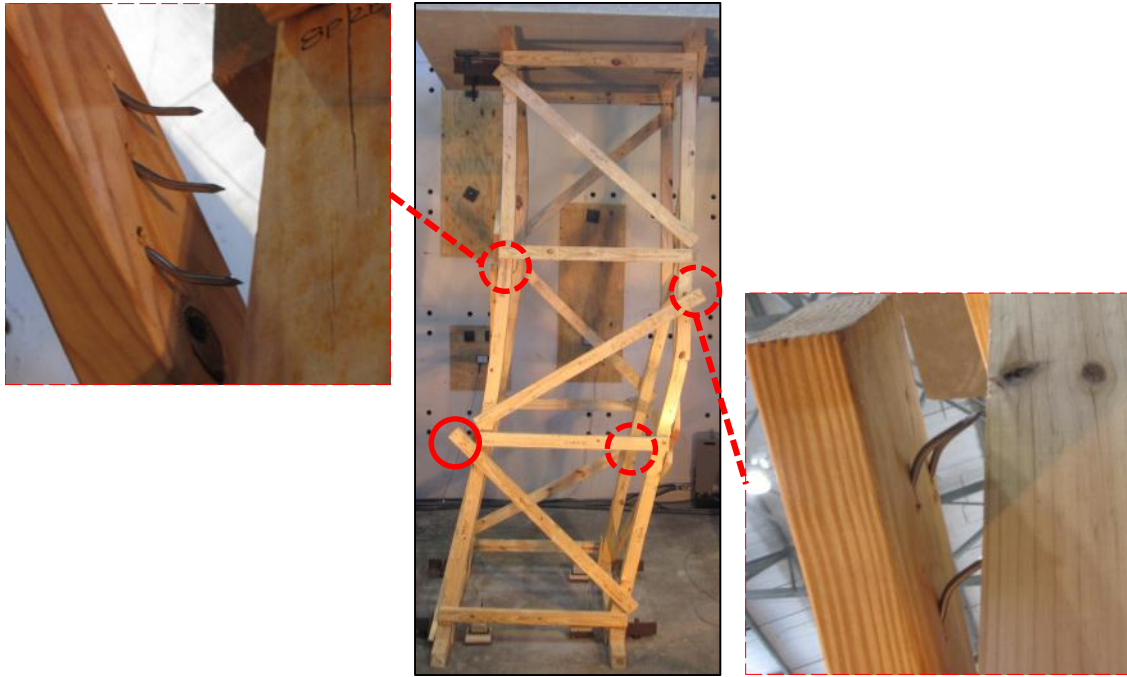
Joint failures of horizontal and diagonal braces for Test 8
